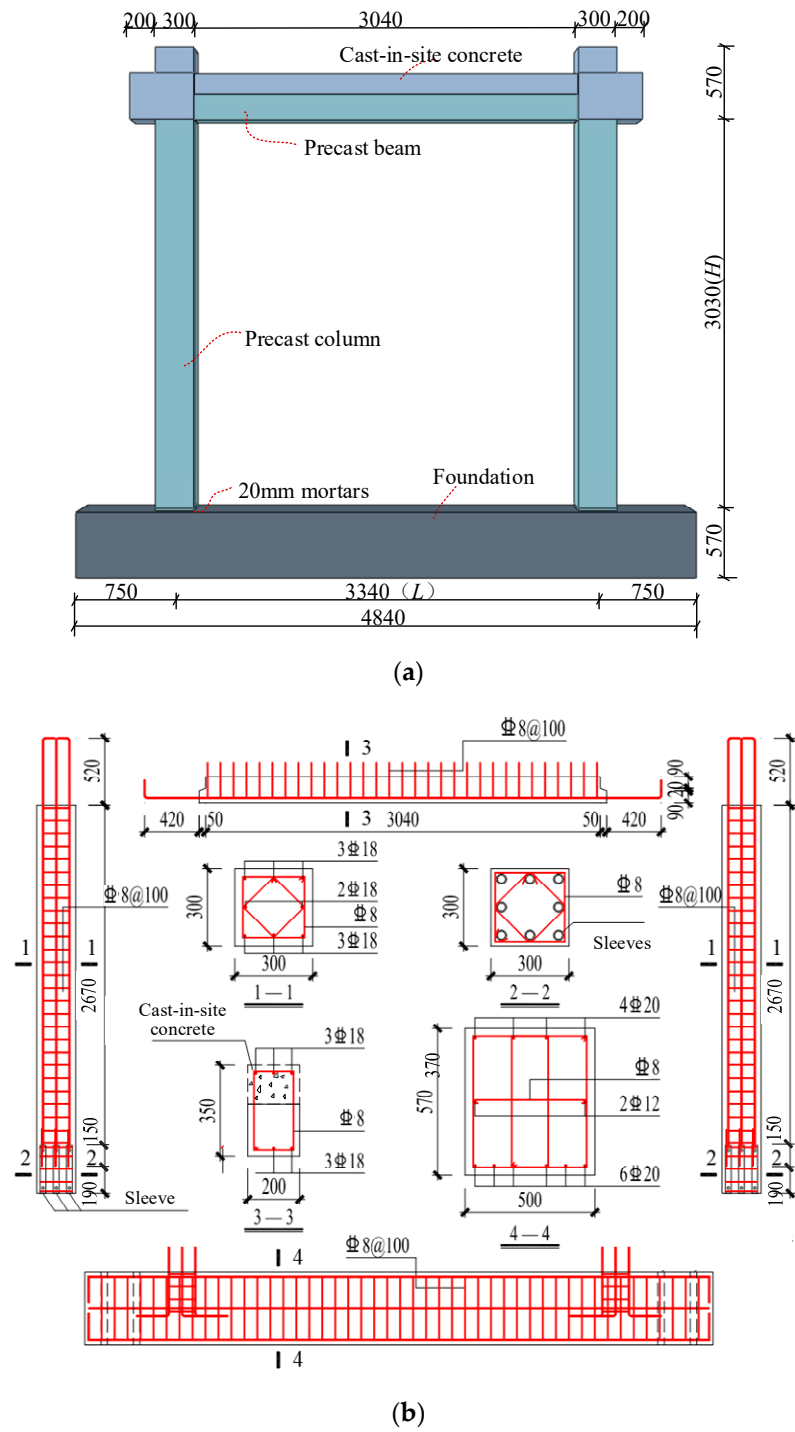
Details of PC frame: (a) Configurations of PC frame; (b) Reinforcements of precast concrete members.
